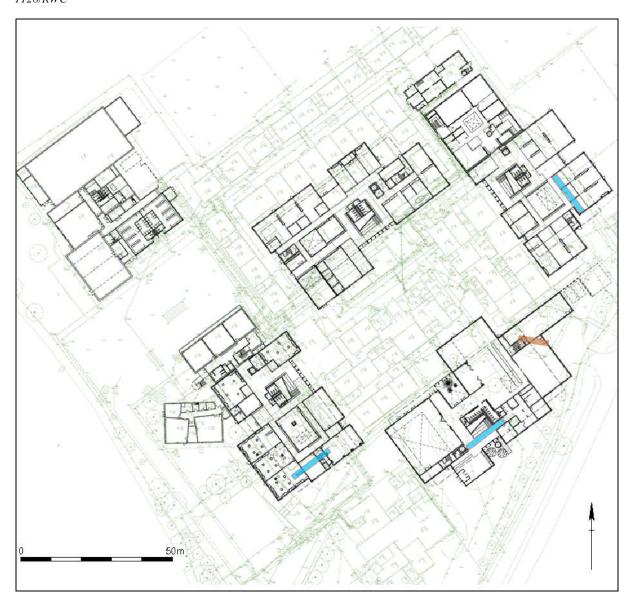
Proposed Development (existing structures in green) (scale 1:1250)
